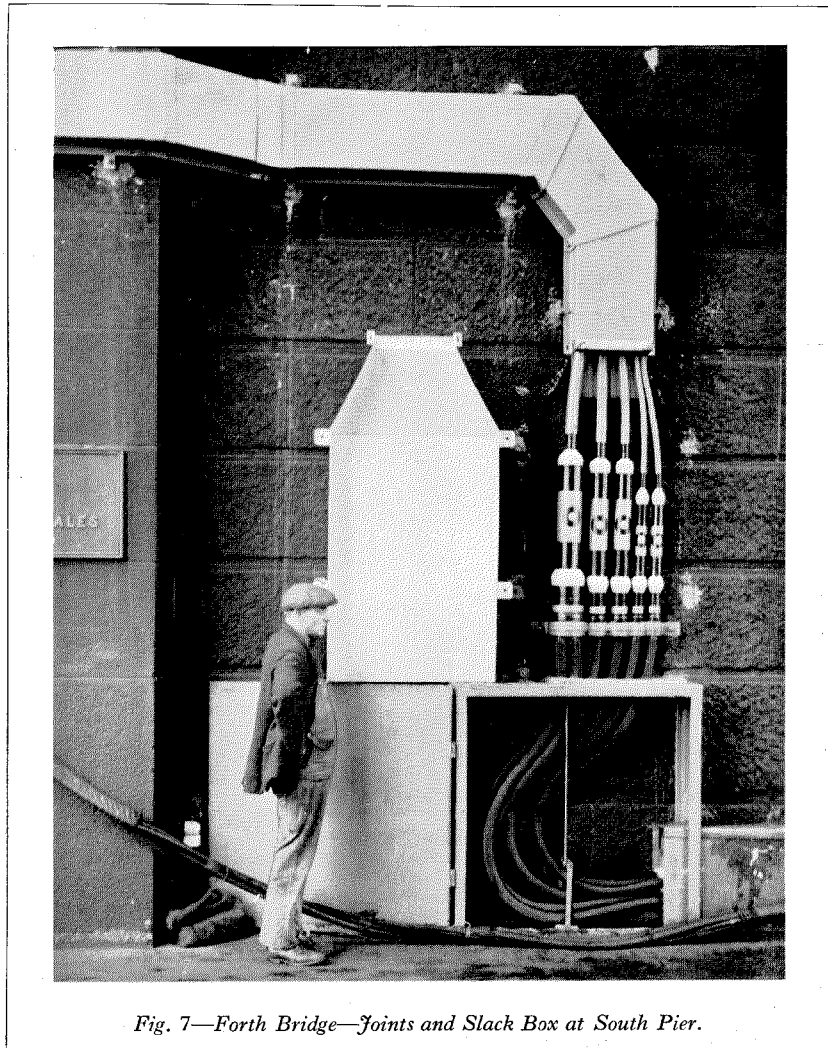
Forth Bridge—Joints and Slack Box at South Pier.
